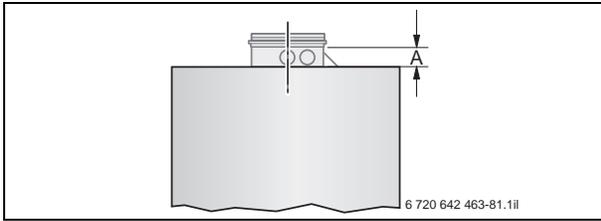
Installed dimensions of the concentric boiler flue connection (dim. A → tab. 65)
